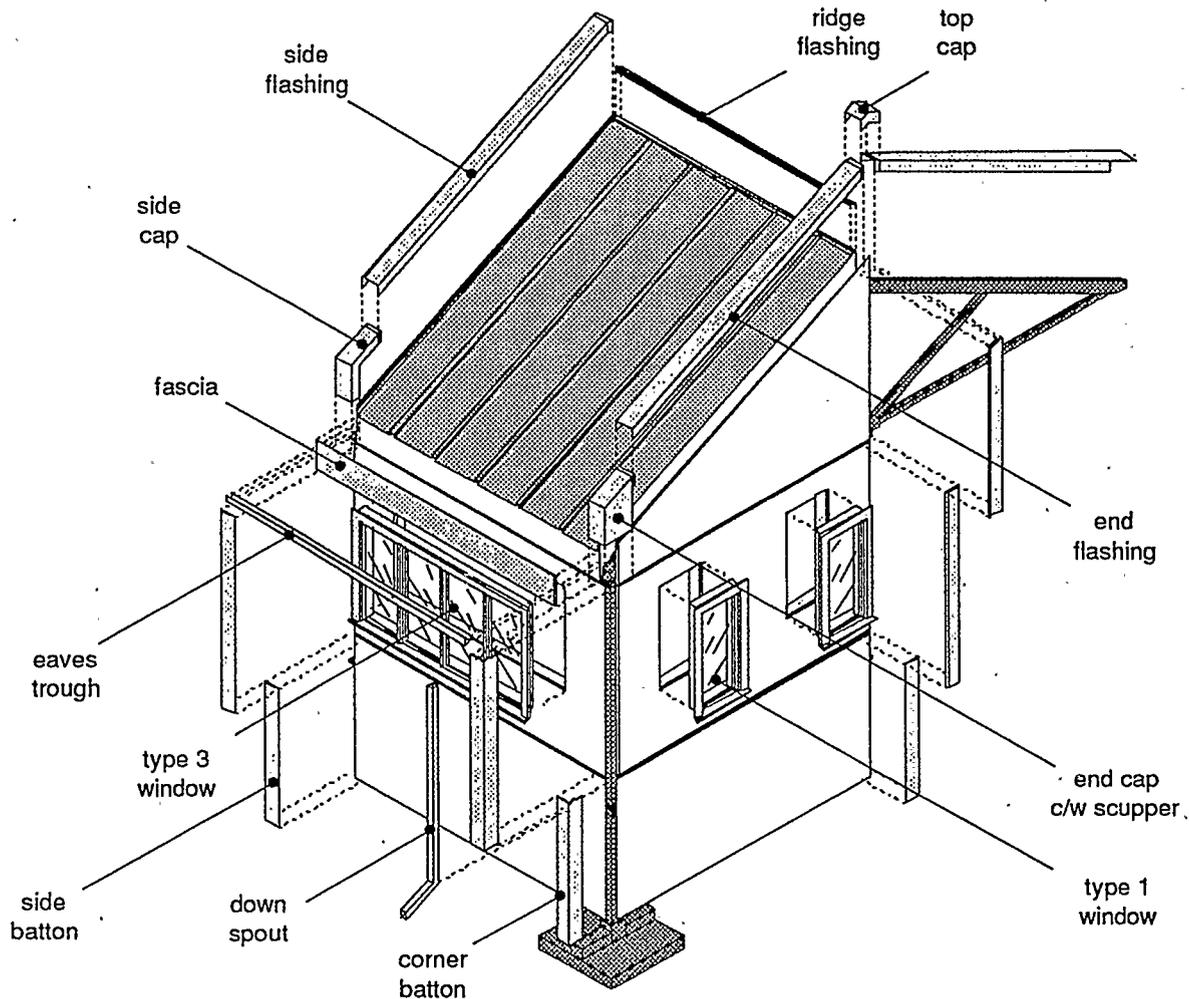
Examples of various windows; flashing; and exterior trim, and their location on the building envelope
